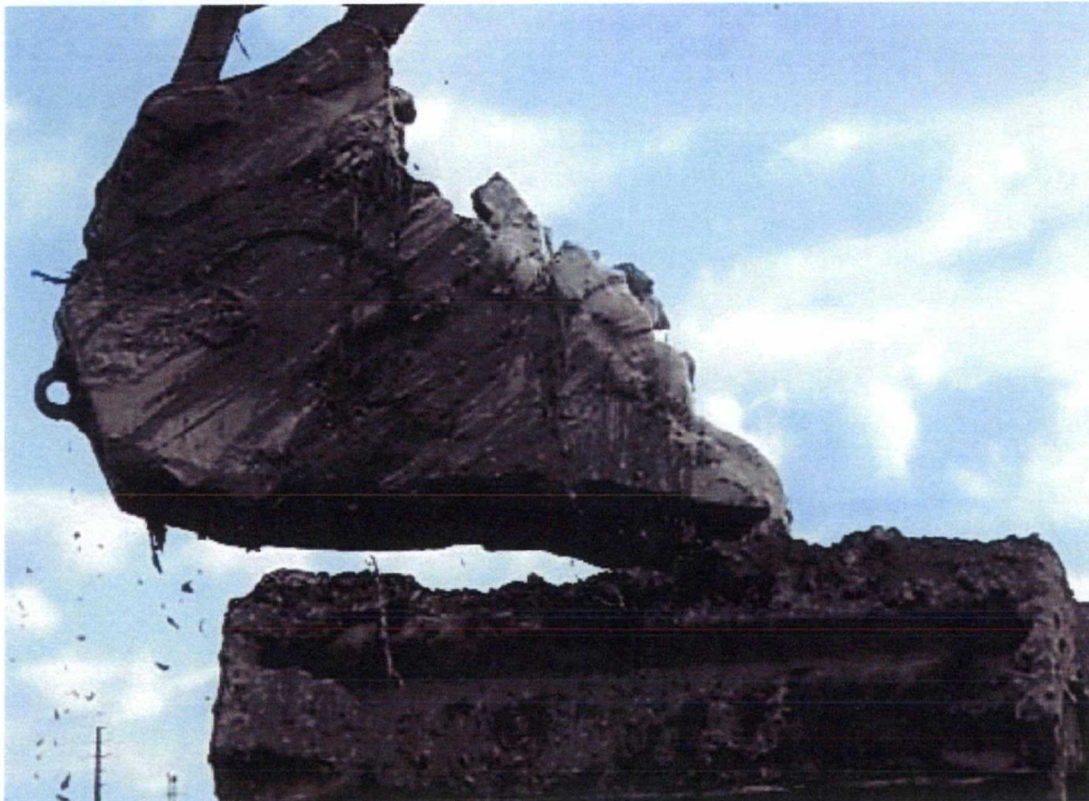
View of the slurry wall excavation with slurry in it. Taken by Michael Audin.
